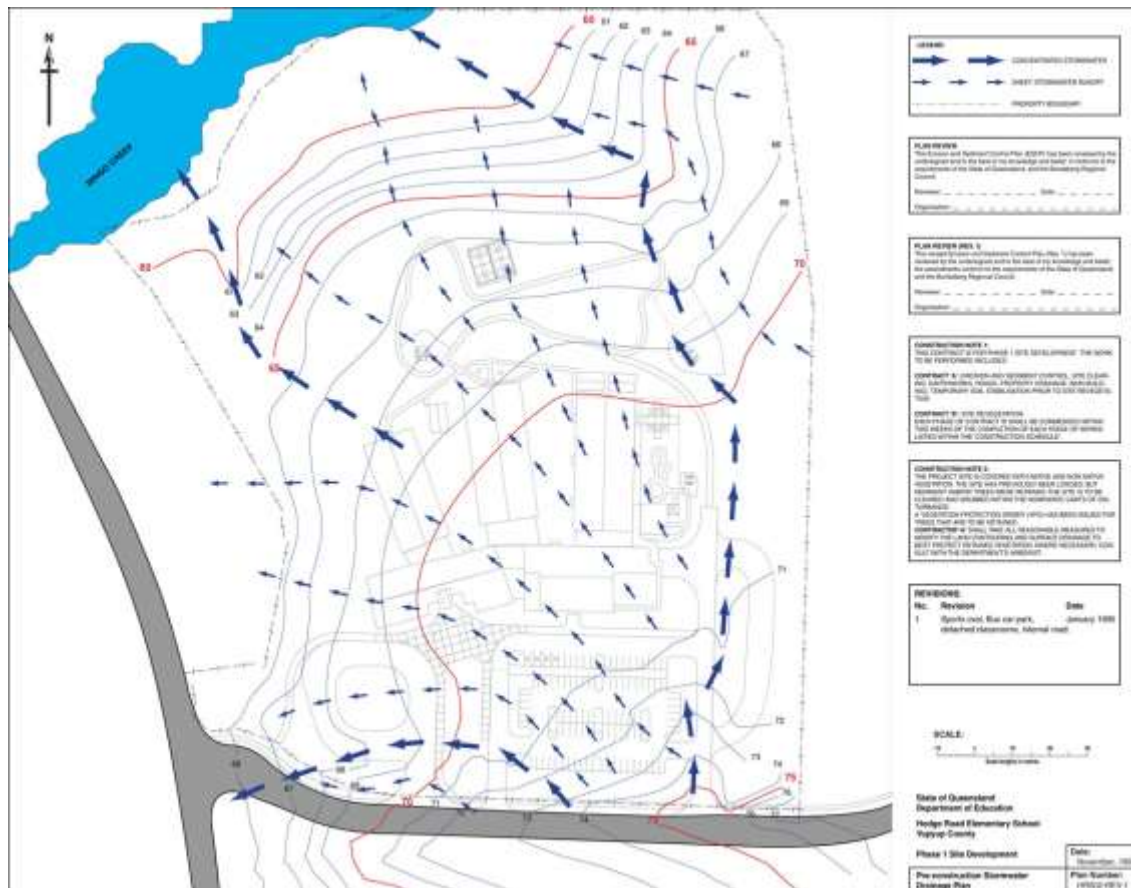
Construction Drainage Plan for the Hodge Road school site
